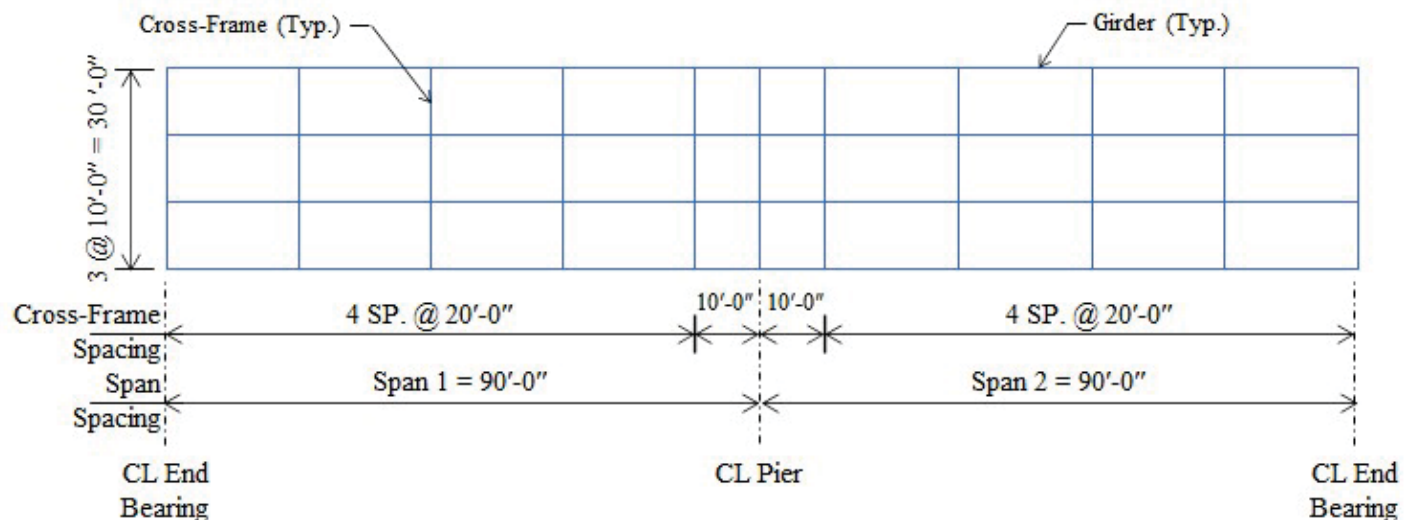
Sketch of superstructure framing plan of bridge; adapted from Barth (2015)
